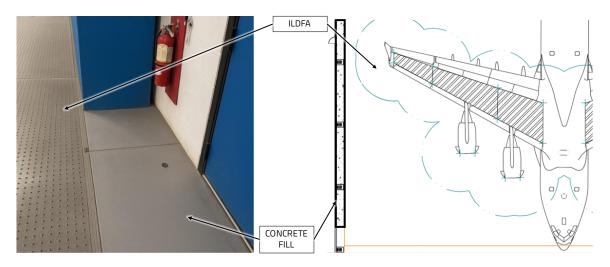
Concrete fill used along perimeter wall (left) and layout drawings of hangar with concrete fill indicated (right).
